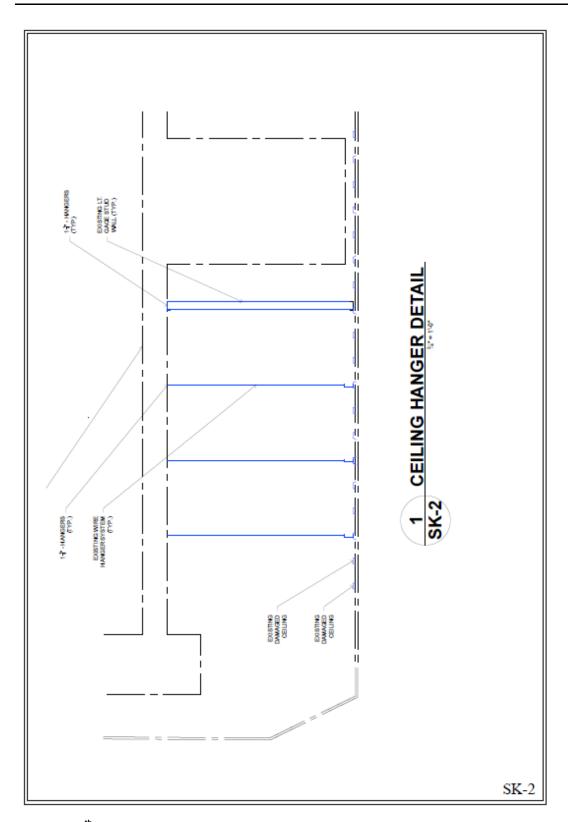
14th Street South Ramp cross section – Sketch for Existing Conditions Details
